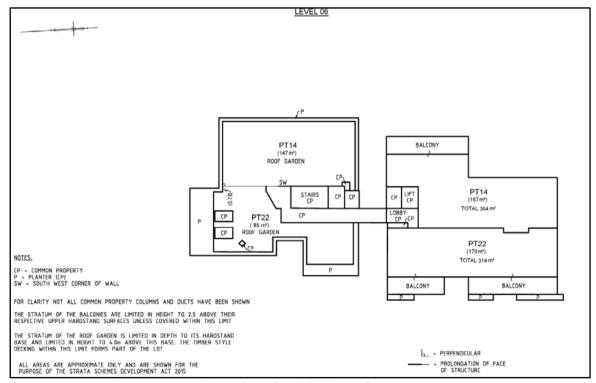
Level 06 Plan of Subdivision of Lot 100 DP 1263318
